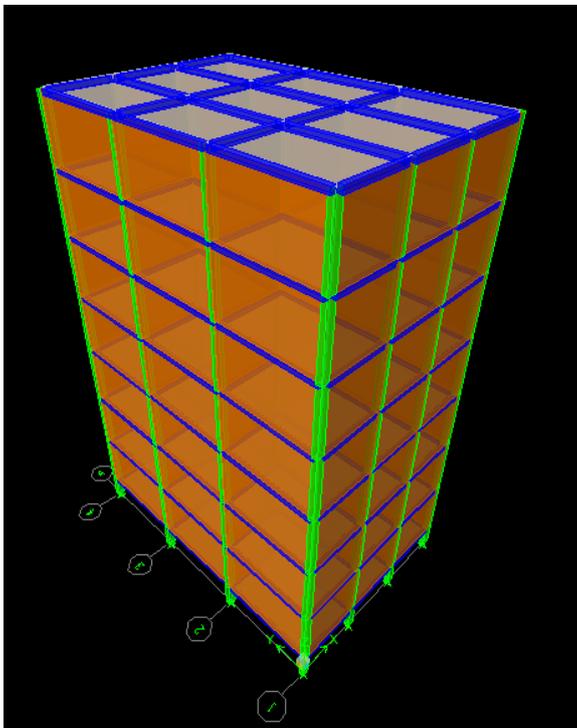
model 3:bare frame with slab element and with infill's (soft story)
